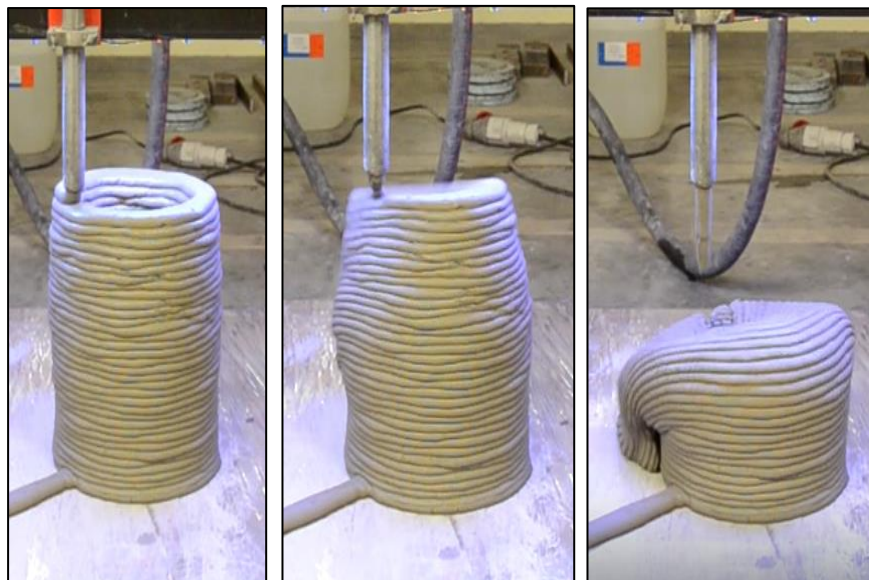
FA_4 COLUMN FAILURE TRIAL 2
